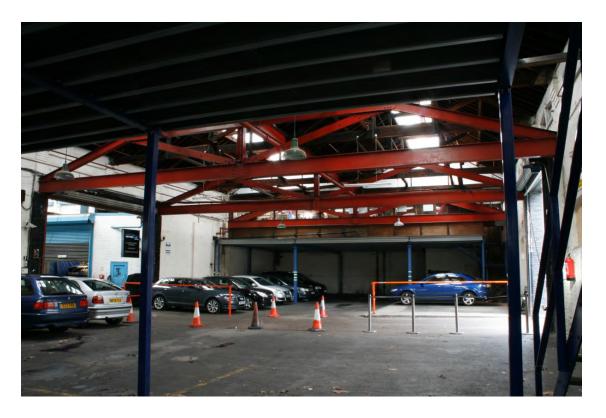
Internal view of the parking area and mezzanine at the north-east end of the building, looking west (72FmLa D100 013)
